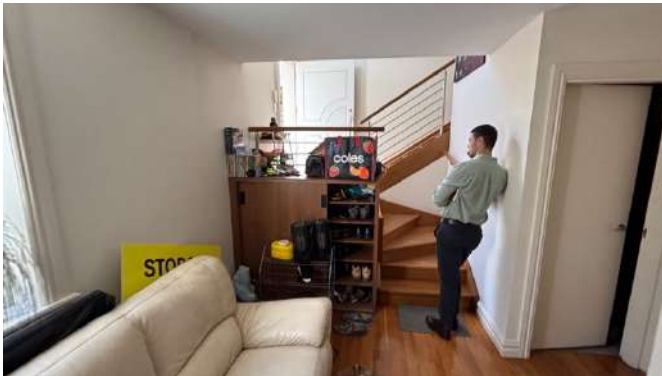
The foyer of the lower ground floor leading to the stairs up to the ground floor.
